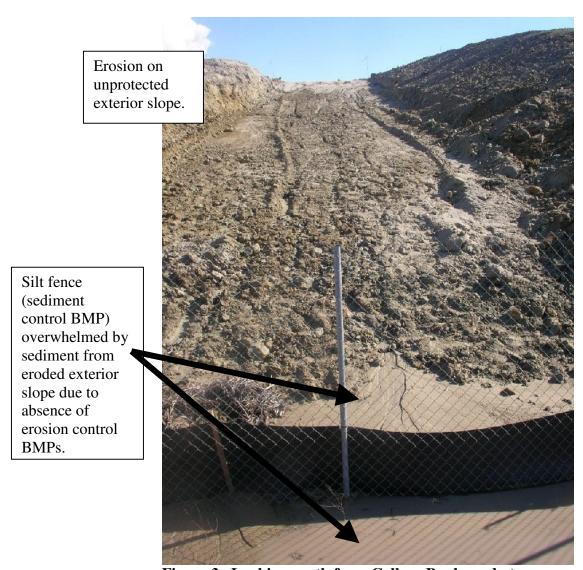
Looking south from College Boulevard at erosion on exterior slope that was deposited on the sidewalk. IMGP0937.JPG
